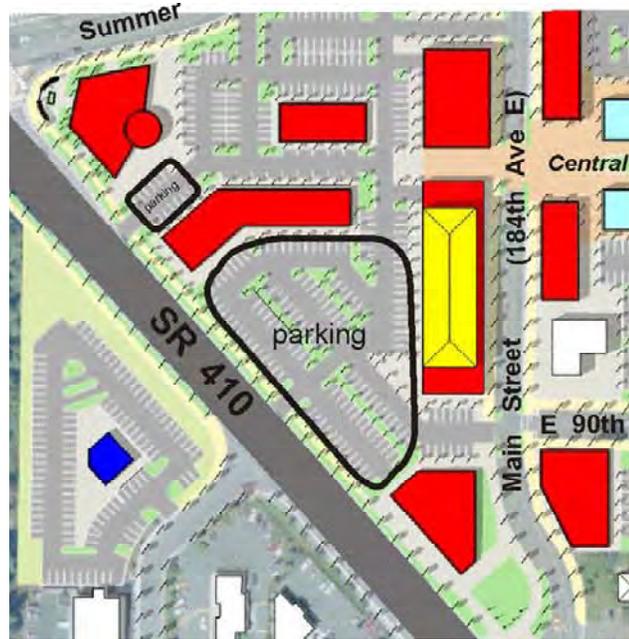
20' wide planting strips are required along SR-410 between the back of the sidewalk and any parking area.
